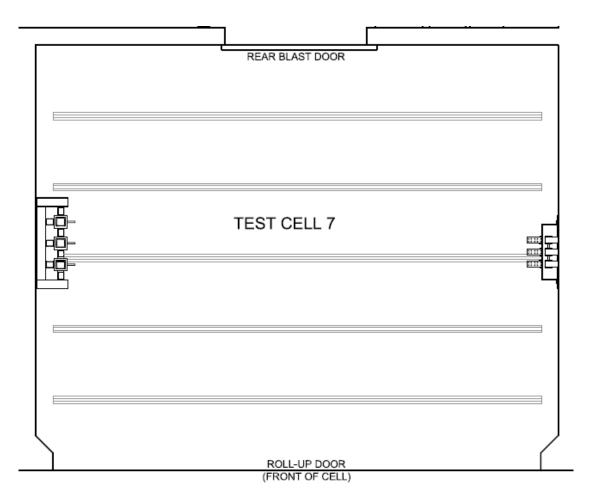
Plan view of Test Cell #7. Low-voltage power connections located on right side of drawing.
